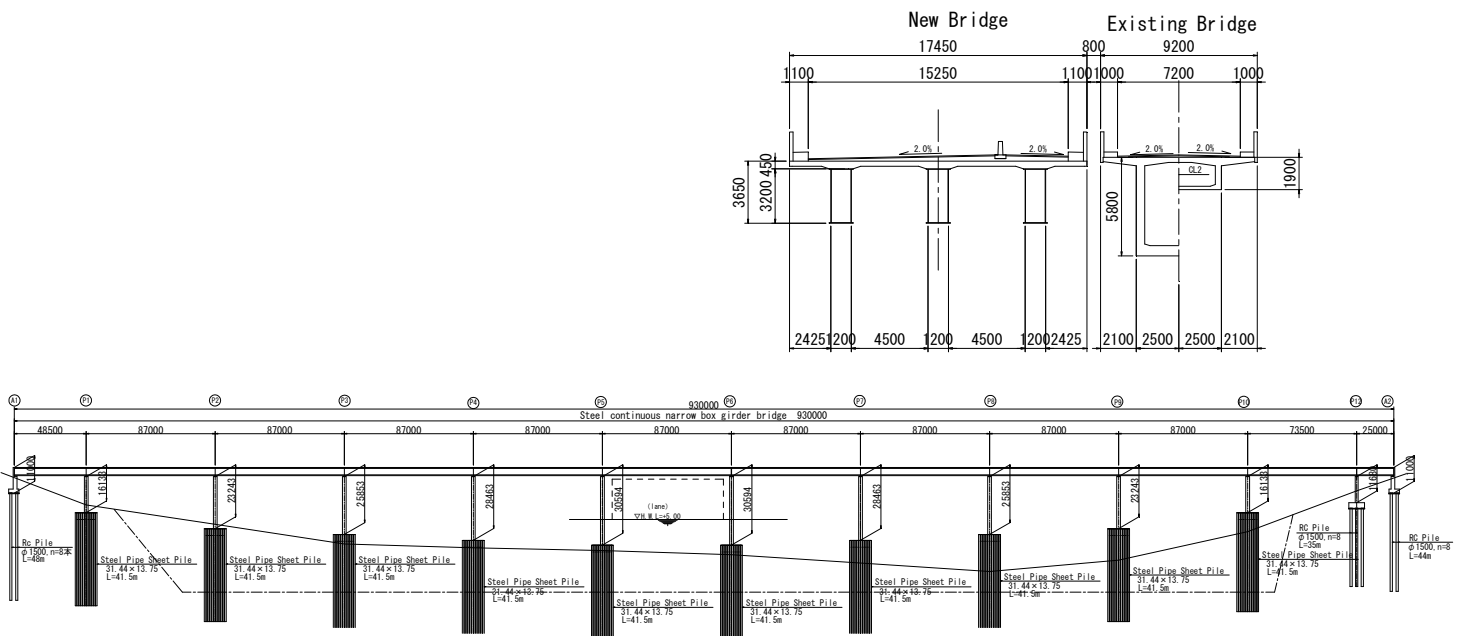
Cross-Section and Side View of Option-3 (Meghna Bridge)
